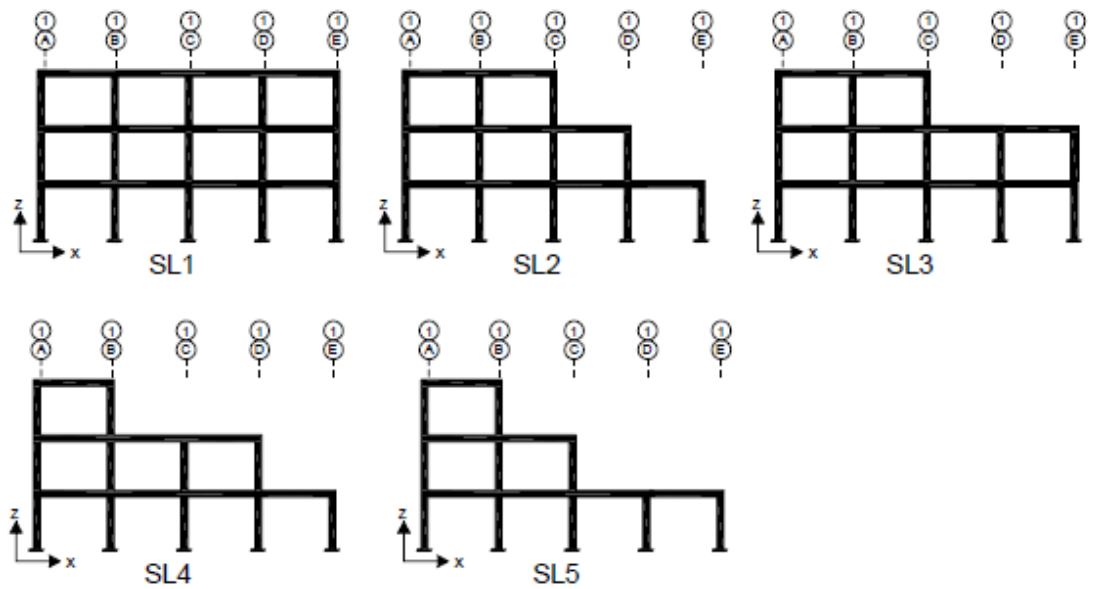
Elevation view of three story RC frame (vertical geometry irregularity-setback)
